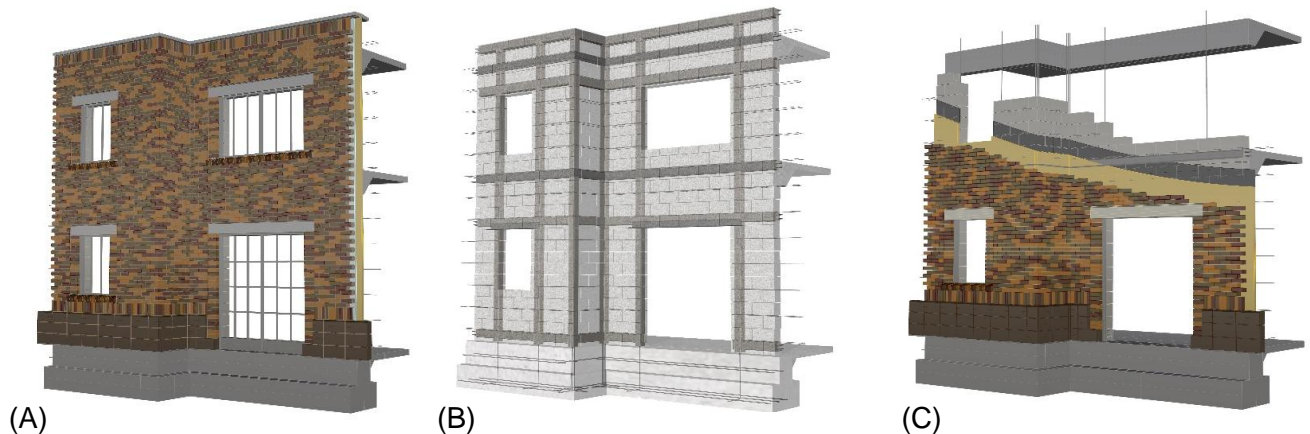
Architectural (A), structural engineering (B), and mason contractor (C) views of the masonry wall model.
